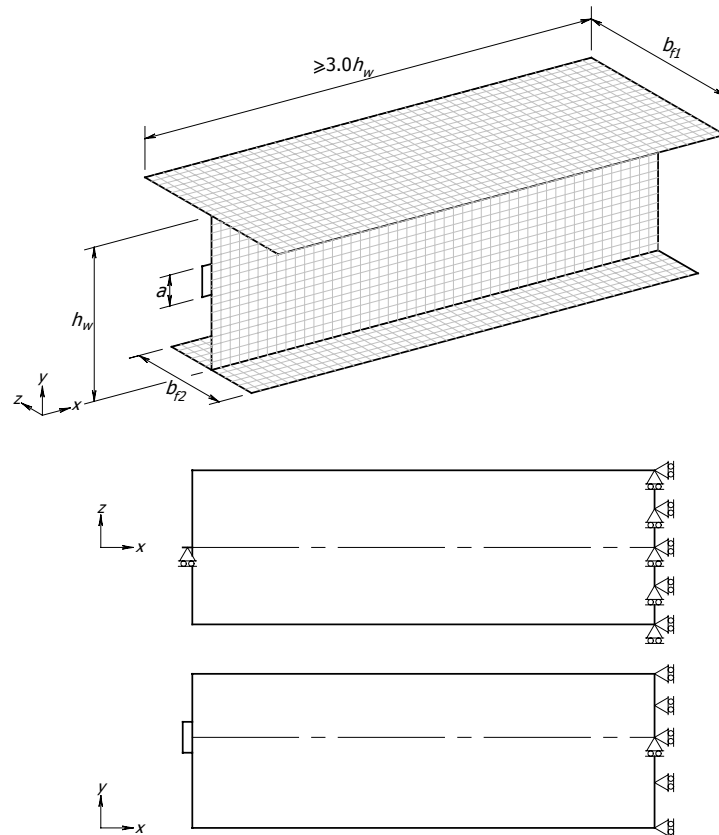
TYPICAL MODEL USED IN THE STUDY OF ANCHORAGE ZONE WITH FLANGED SECTION
